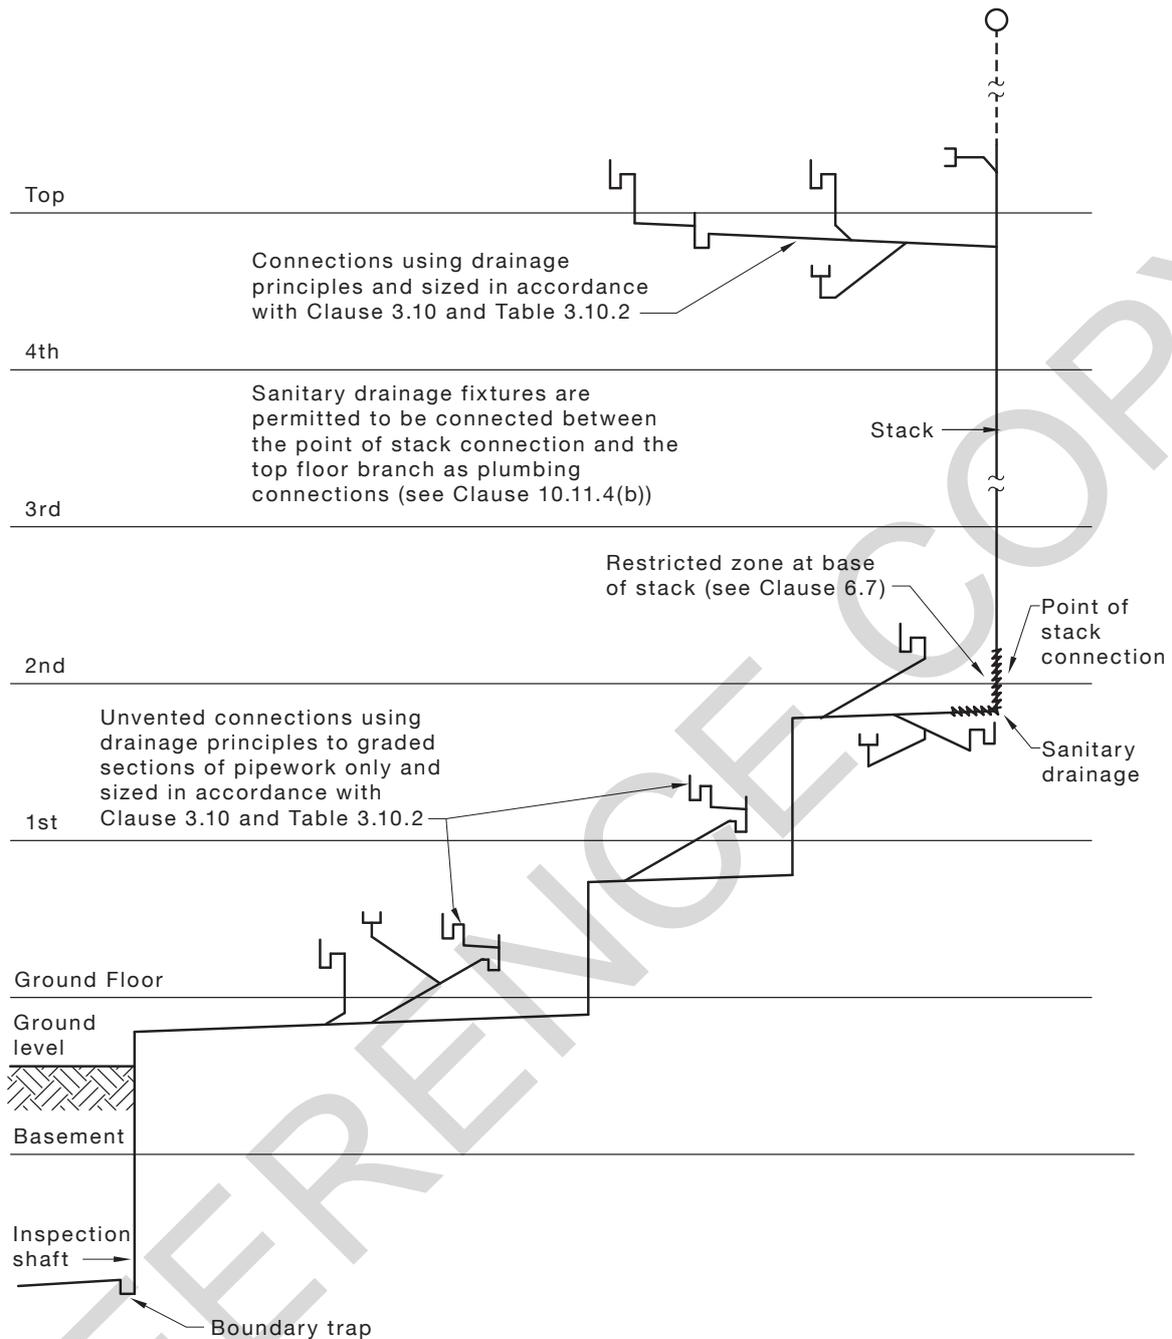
ABOVE-GROUND (ELEVATED) PIPEWORK WITHIN BUILDING—
